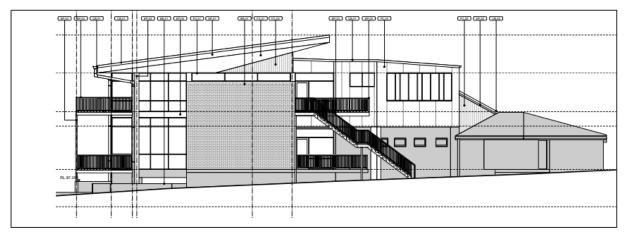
| Northern elevation fronting the Cemetery (Source: Applicant's EIS)
